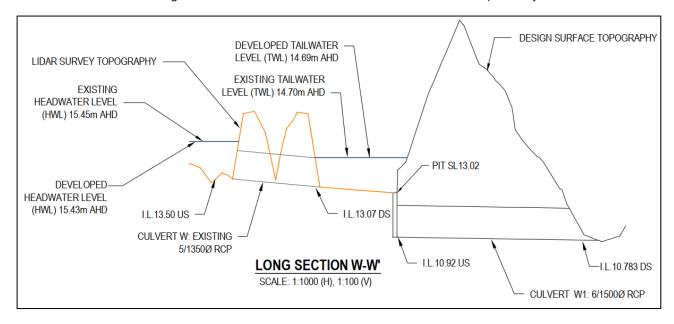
CULVERT W AND W1 LONGITUDINAL SECTION
